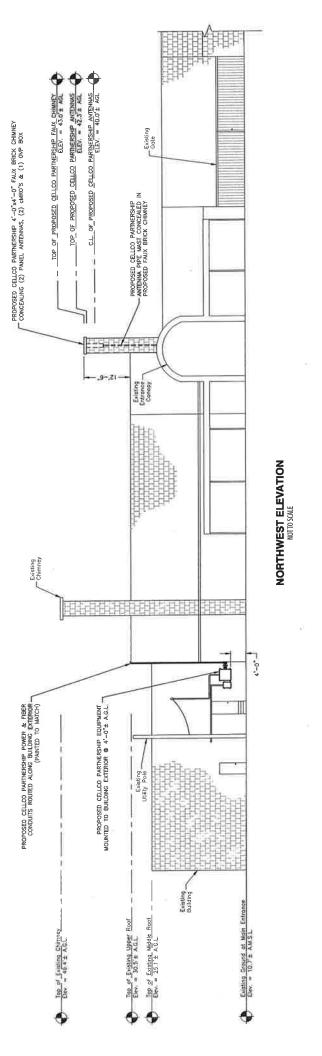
PROPOSED EQUIPMENT LOCATION AND ELEVATION PLAN
